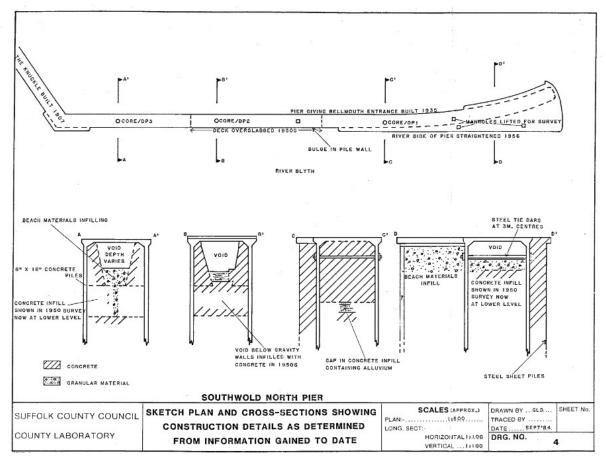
1984 North Pier study: Plan and Cross-sections
